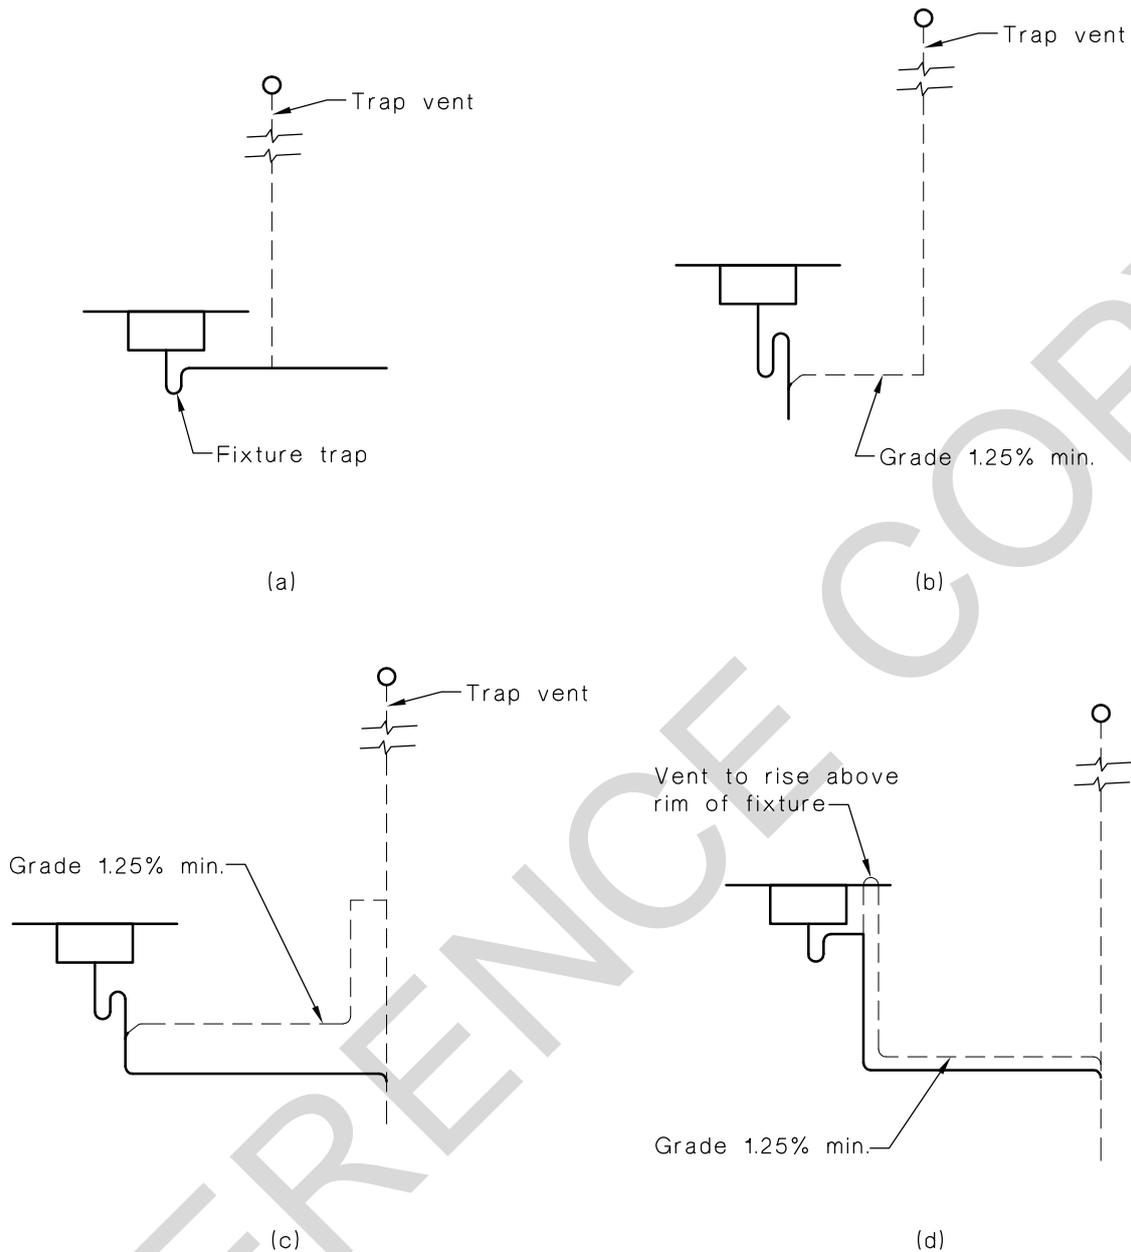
TYPICAL INSTALLATION OF TRAP VENTS
